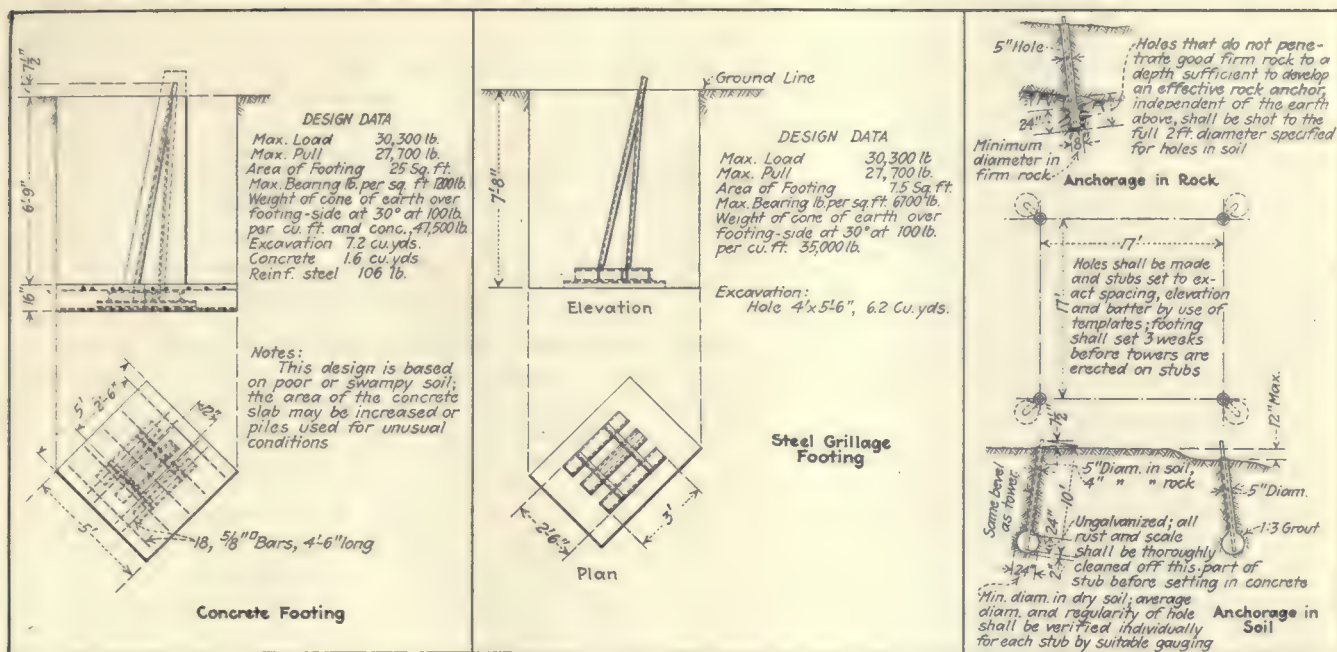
GRILLAGE AND CONCRETE TOWER FOOTINGS AND METHODS OF ANCHORAGE
